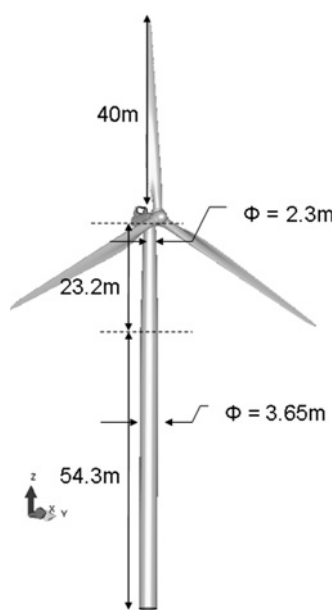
Turbine tower geometry showing cylindrical section beneath a truncated cone
